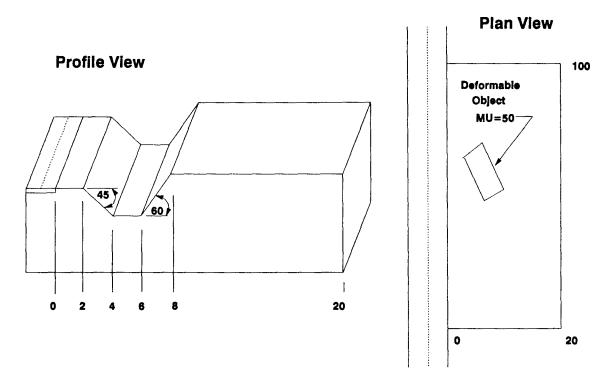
Hazardous Roadside Area: Flattening Embankment Slope Warranted
